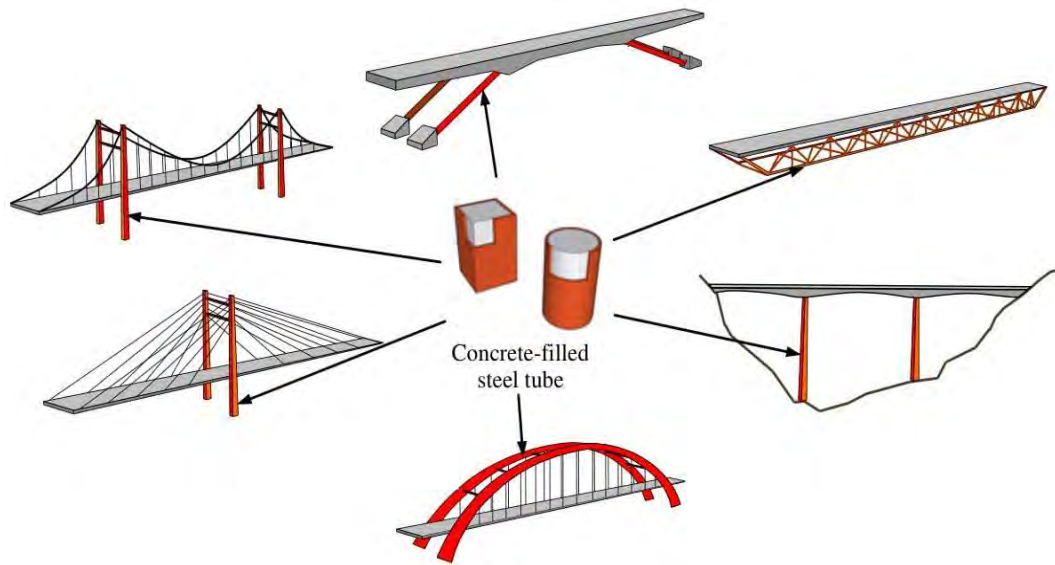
CFST used in bridges (Yang and Han, 2011)
